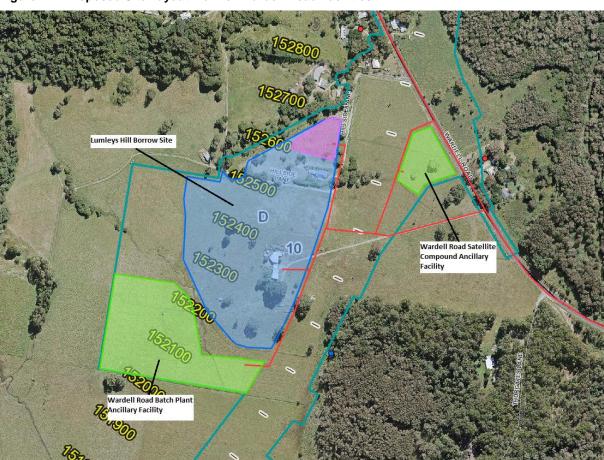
Proposed Site Layout Plan for Wardell Road Facilities
